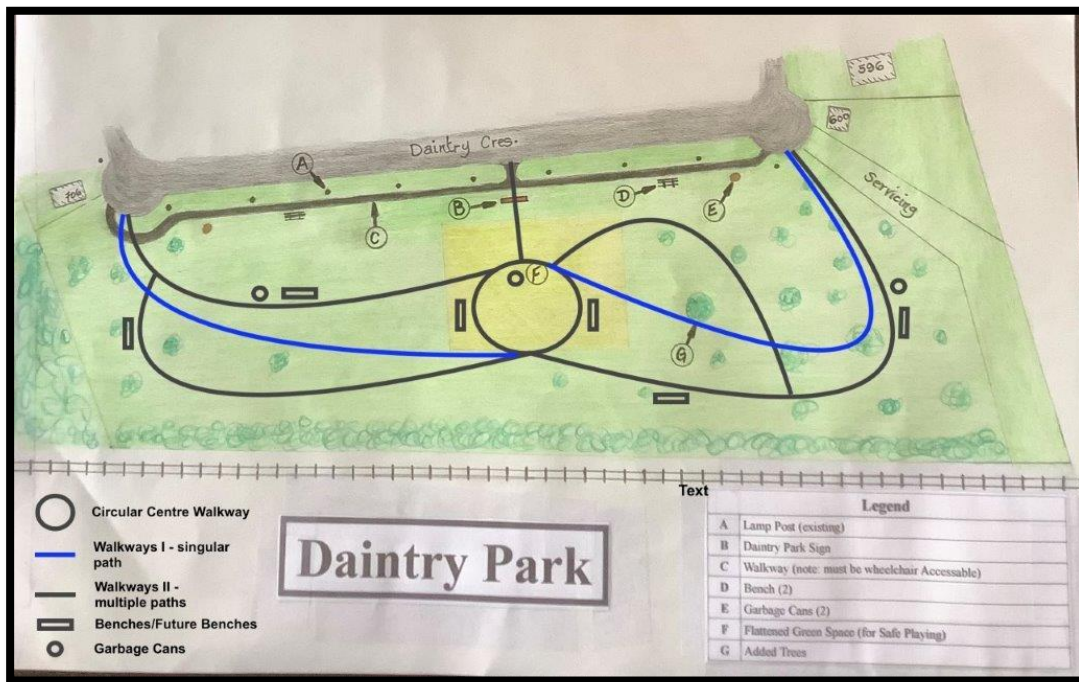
Daintry Park concept plan, presented to Committee of the Whole, Jan 24/22
